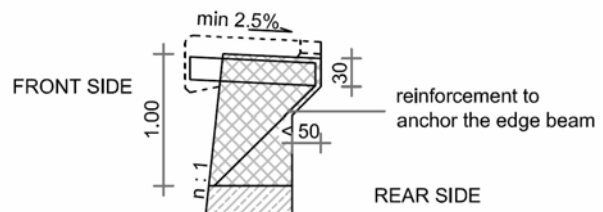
Detail of crown of concrete gravity retaining/supporting wall
